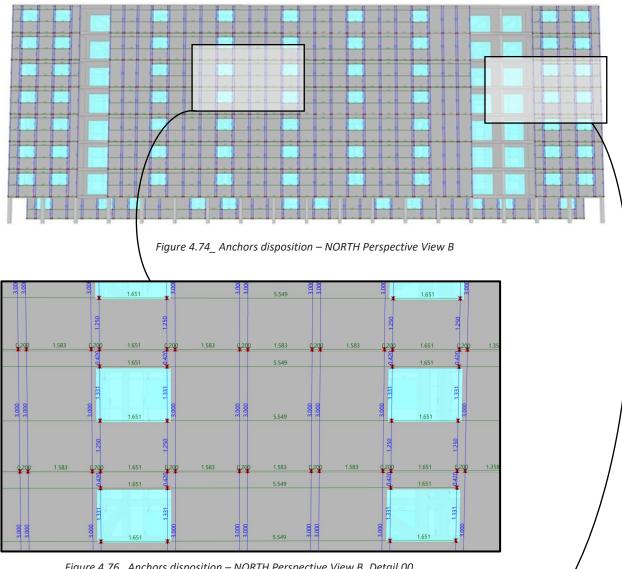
Anchors disposition – NORTH Perspective View B_Detail.00
